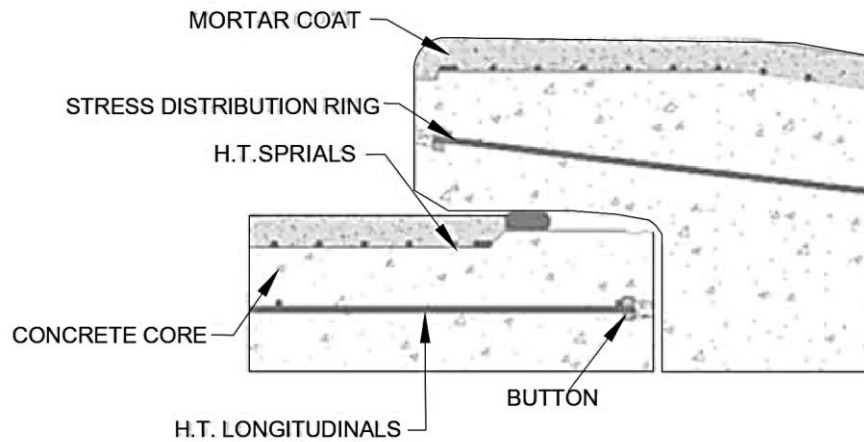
PSC (Non-Cylinder Type) Pipe Roll on Joint Details
